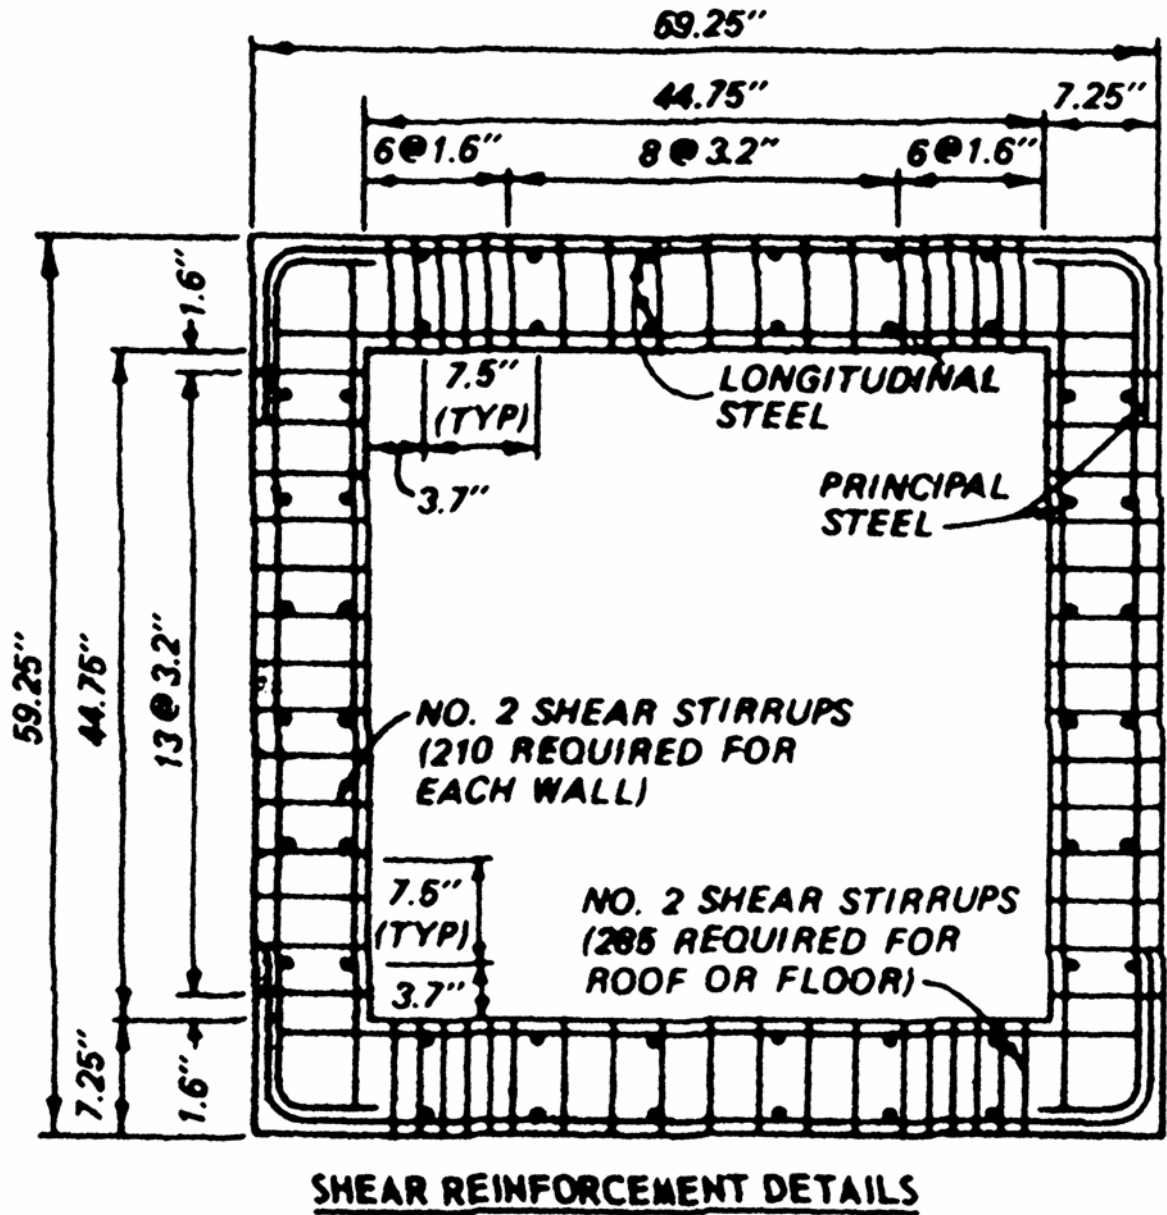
(FY82) Shear reinforcement for DS2-1 to DS2-6 (after Slawson (1984)).
